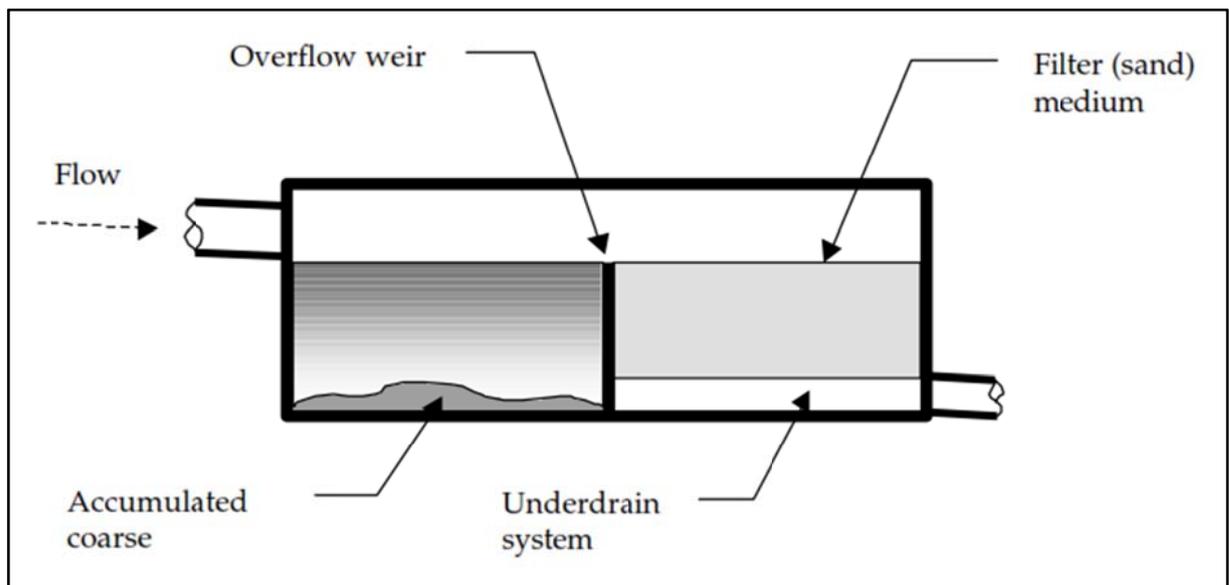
Cros section example of Sand Filter (EPA, 1997)
